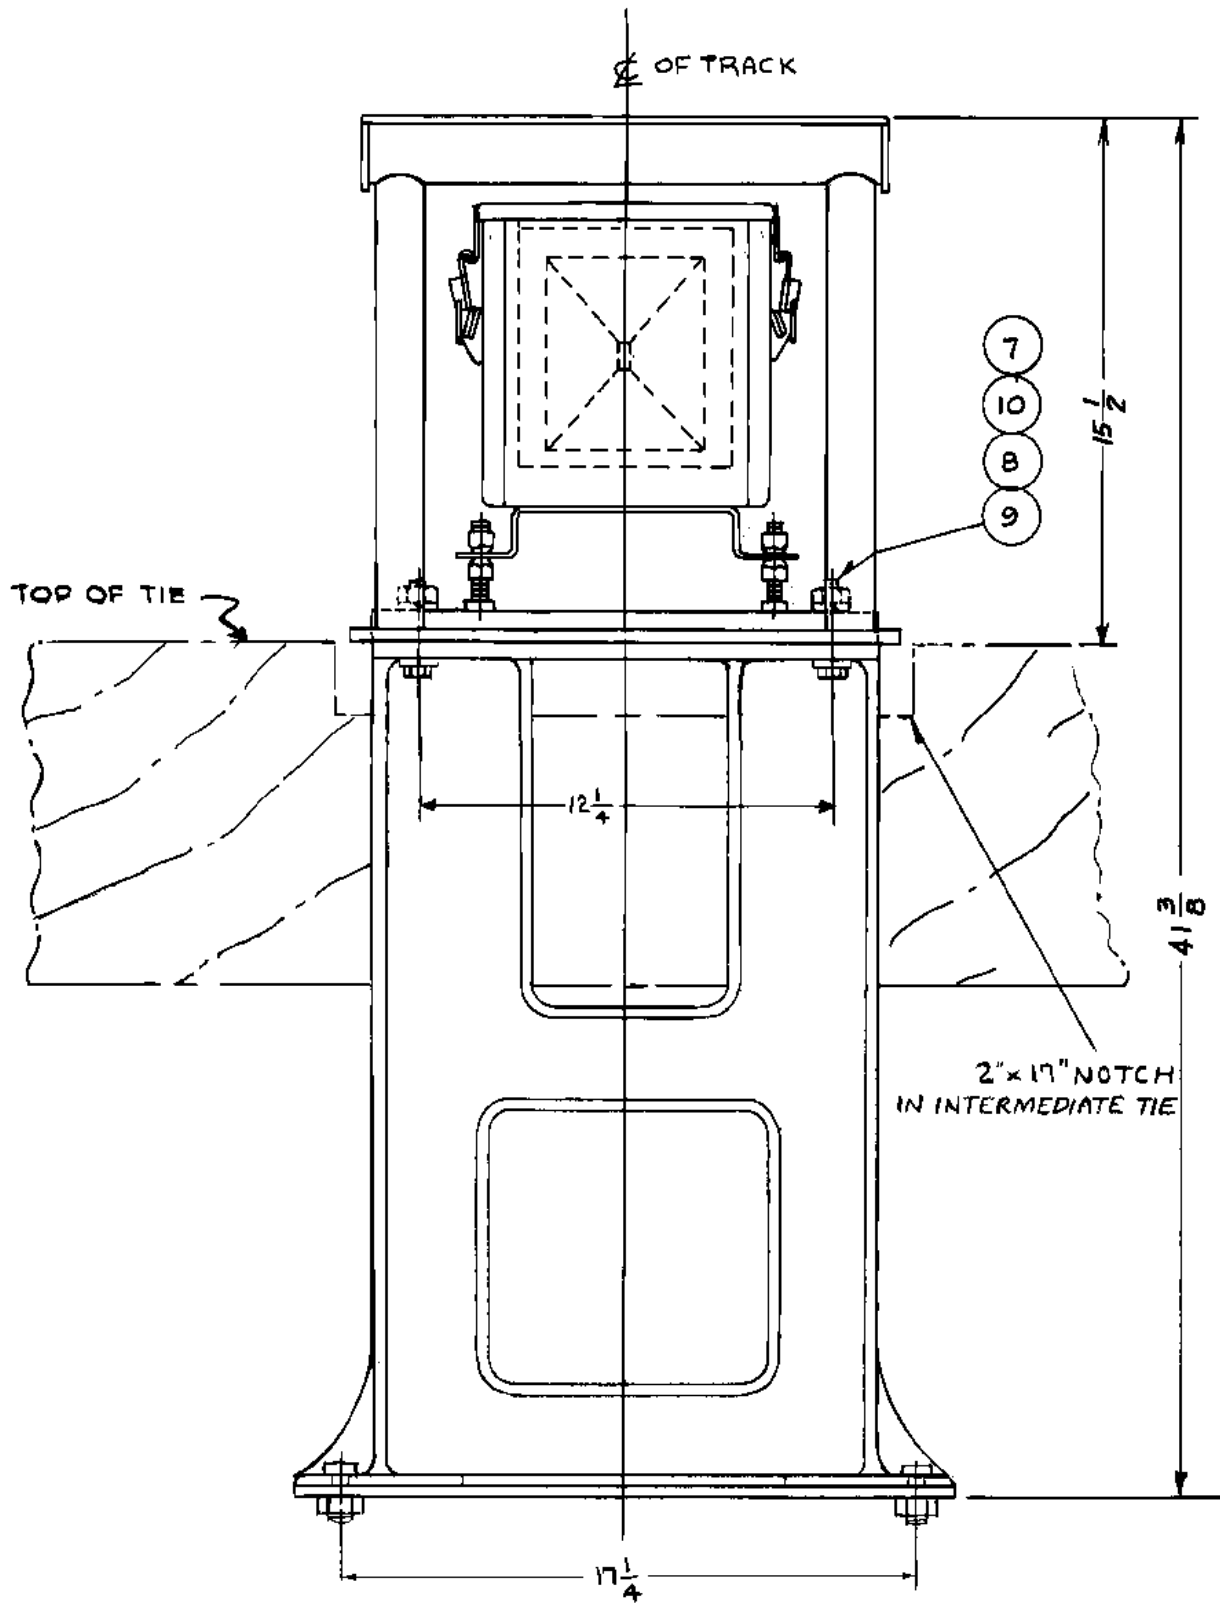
(b). DR-50 Radar, Application Between Rails, Ballast Foundation
